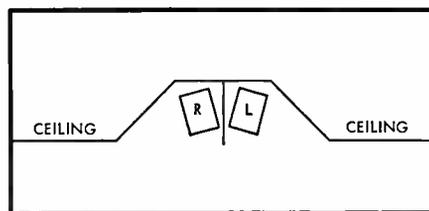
Modification to the ceiling, where proper sound location is needed in a large-floor, low-ceiling installation.
